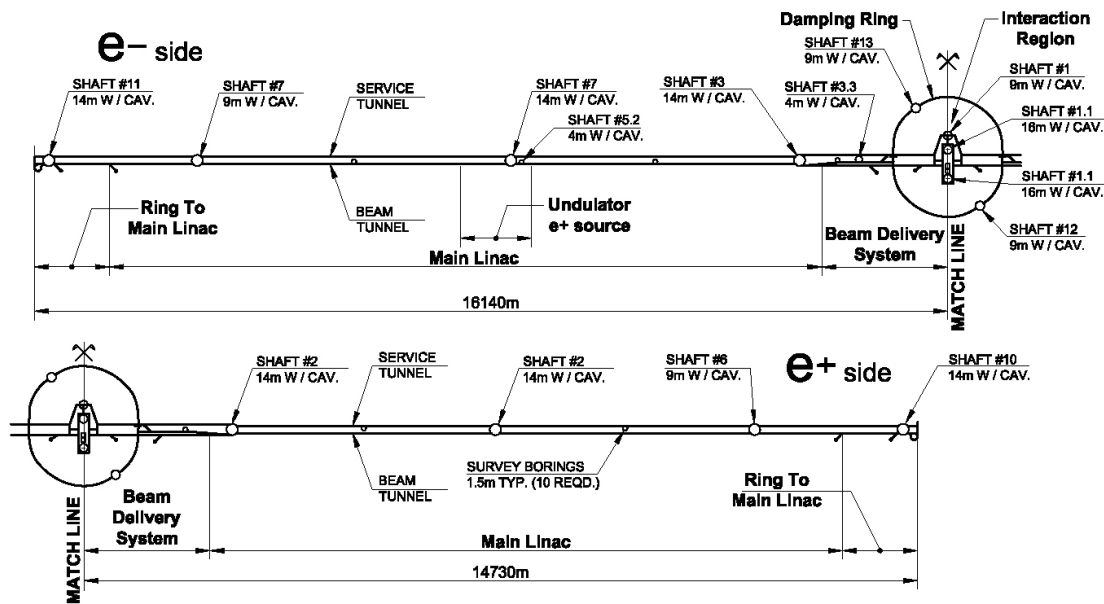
Layout of the Civil Construction, Indicating the Position of Shafts and Caverns
